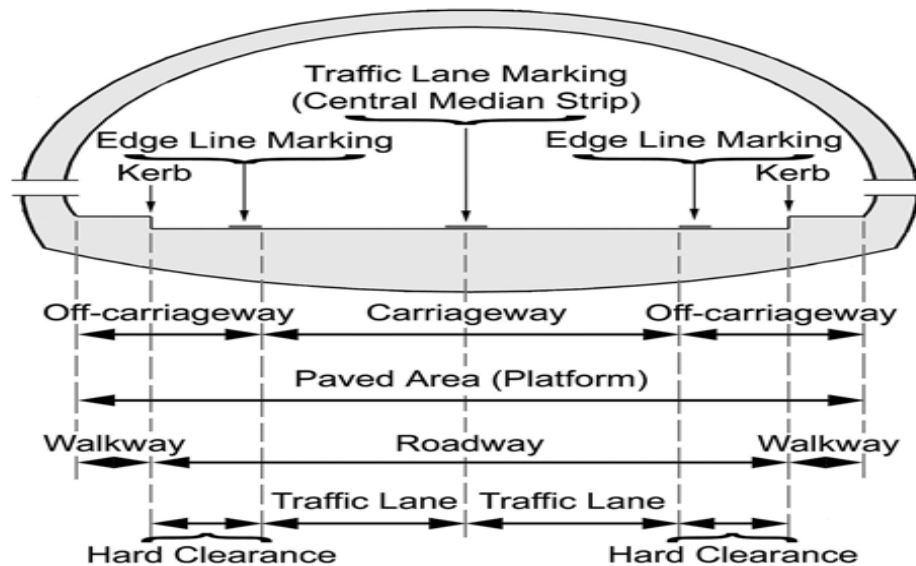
1 cross-section of paved bi-directional tunnel road (Source: B.P. Rigter)
